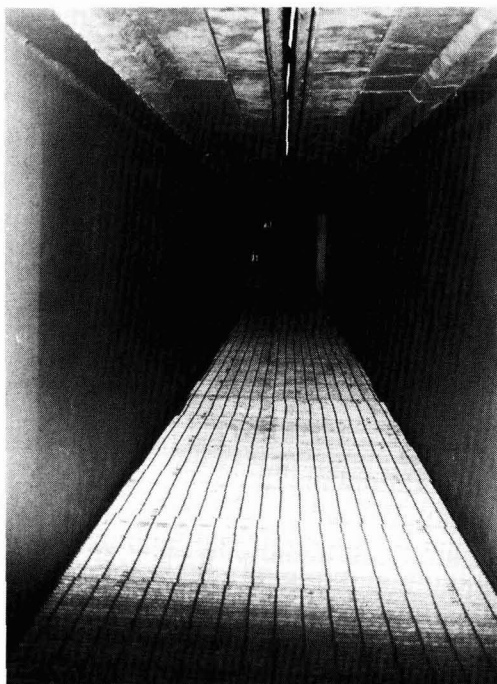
Walkway provided between girders on the Loudwater Viaduct (if sheeting were placed under the mesh the girders would be screened from the atmosphere)
